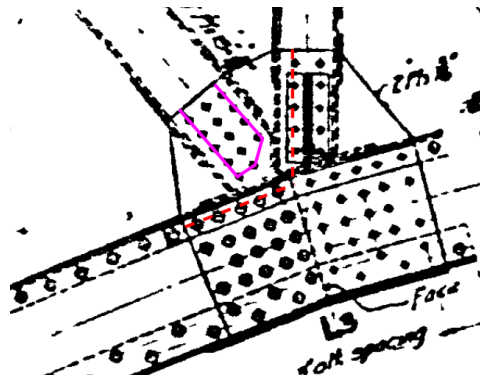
Vertical and horizontal Partial Shear Planes for L3 Gusset
